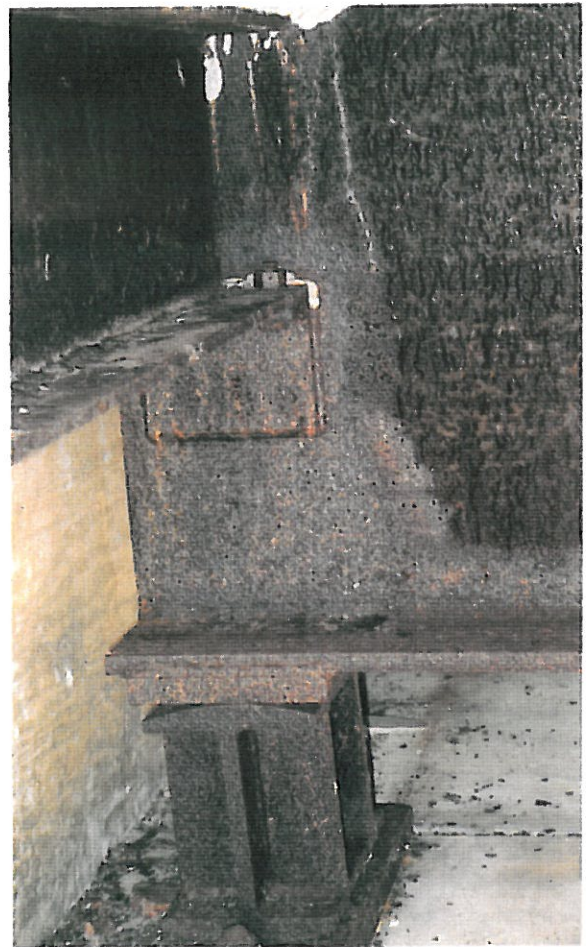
PR Route 52; Bridge #2039 - Built 1972
